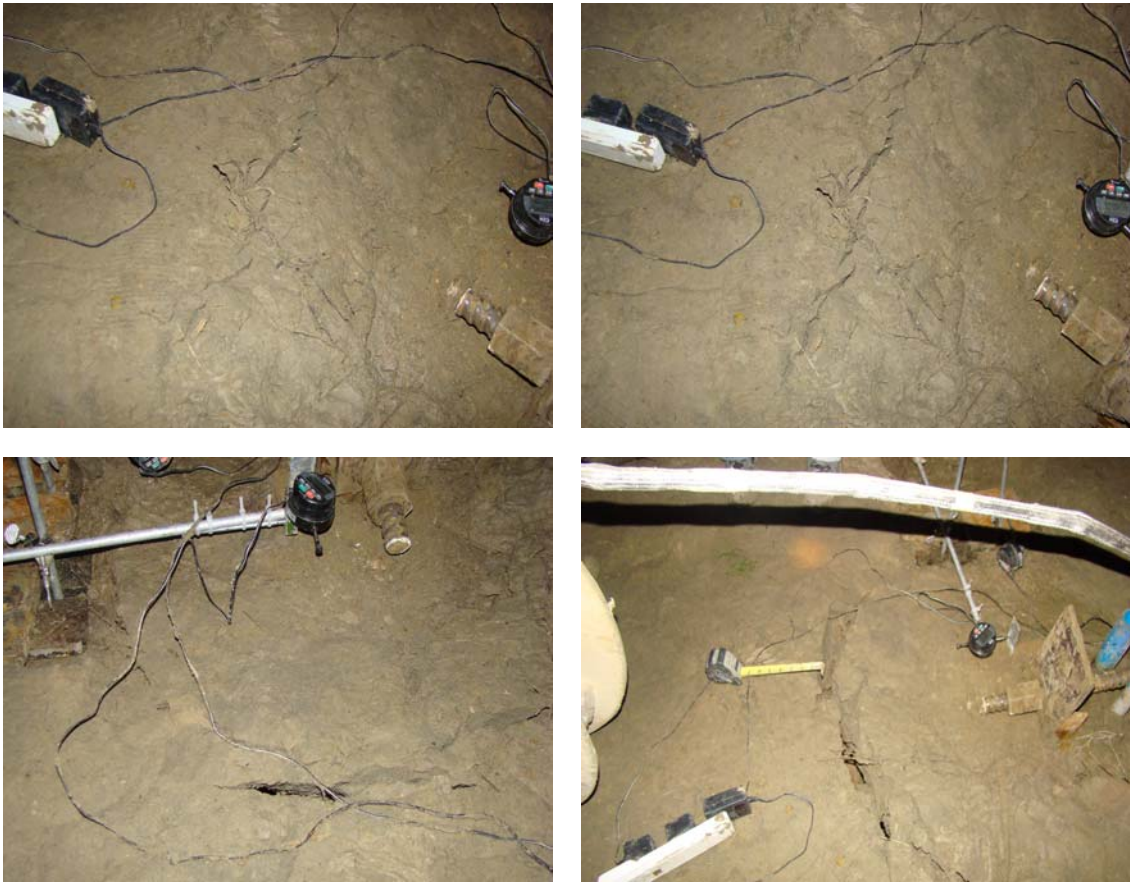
Winter Condition Test Shaft Failures at Night
